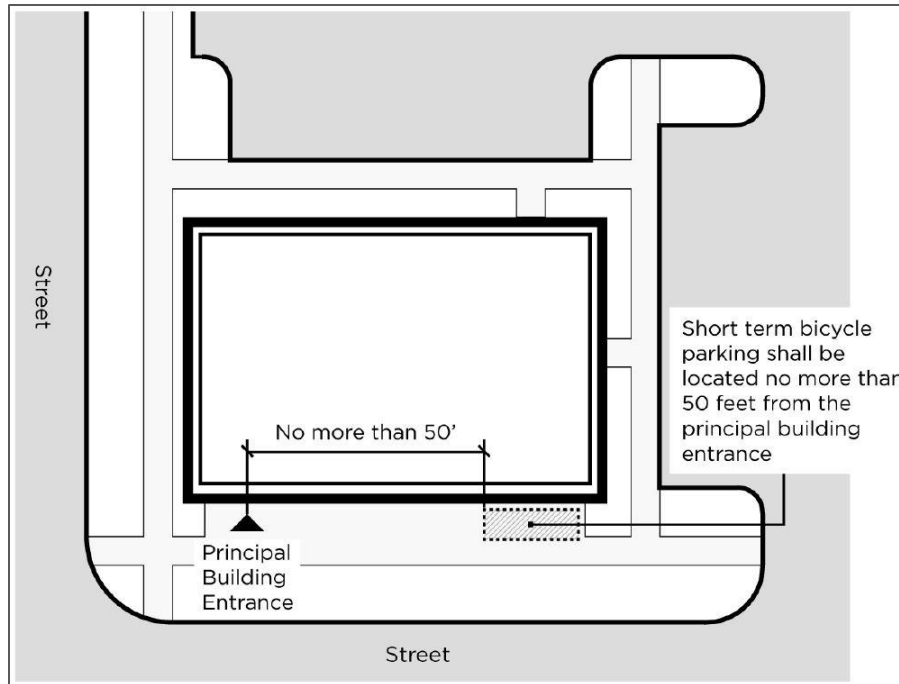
Short Term Bicycle Parking Location Diagram.
